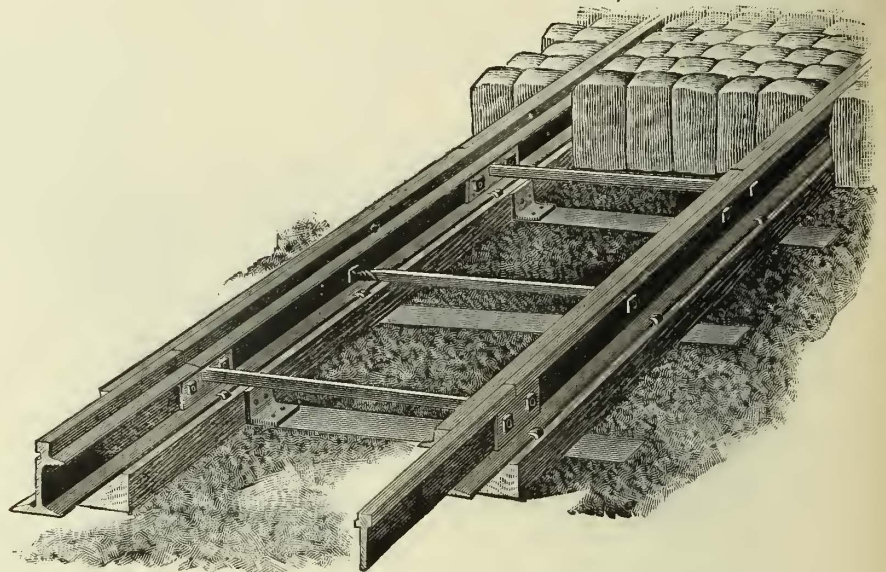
CLEFT RAIL SYSTEM ON WOODEN SUBSTRUCTURE.
